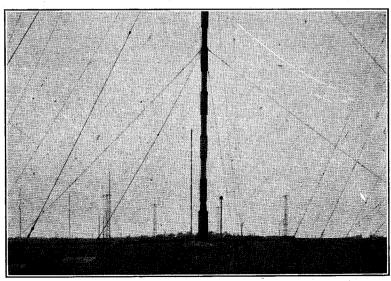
Lower Section of Mast prior to Reconstruction.
